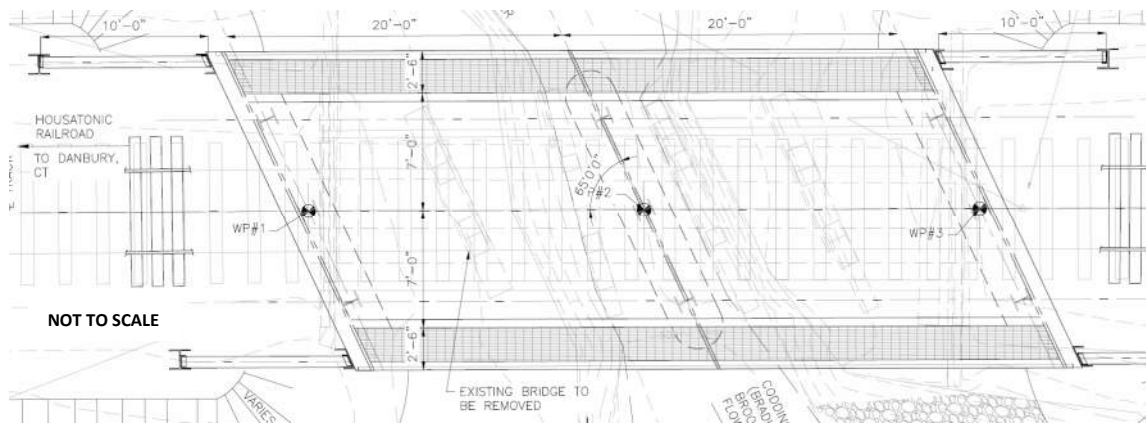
Proposed Bridge Layout Provided by HDR Engineering, Inc.
